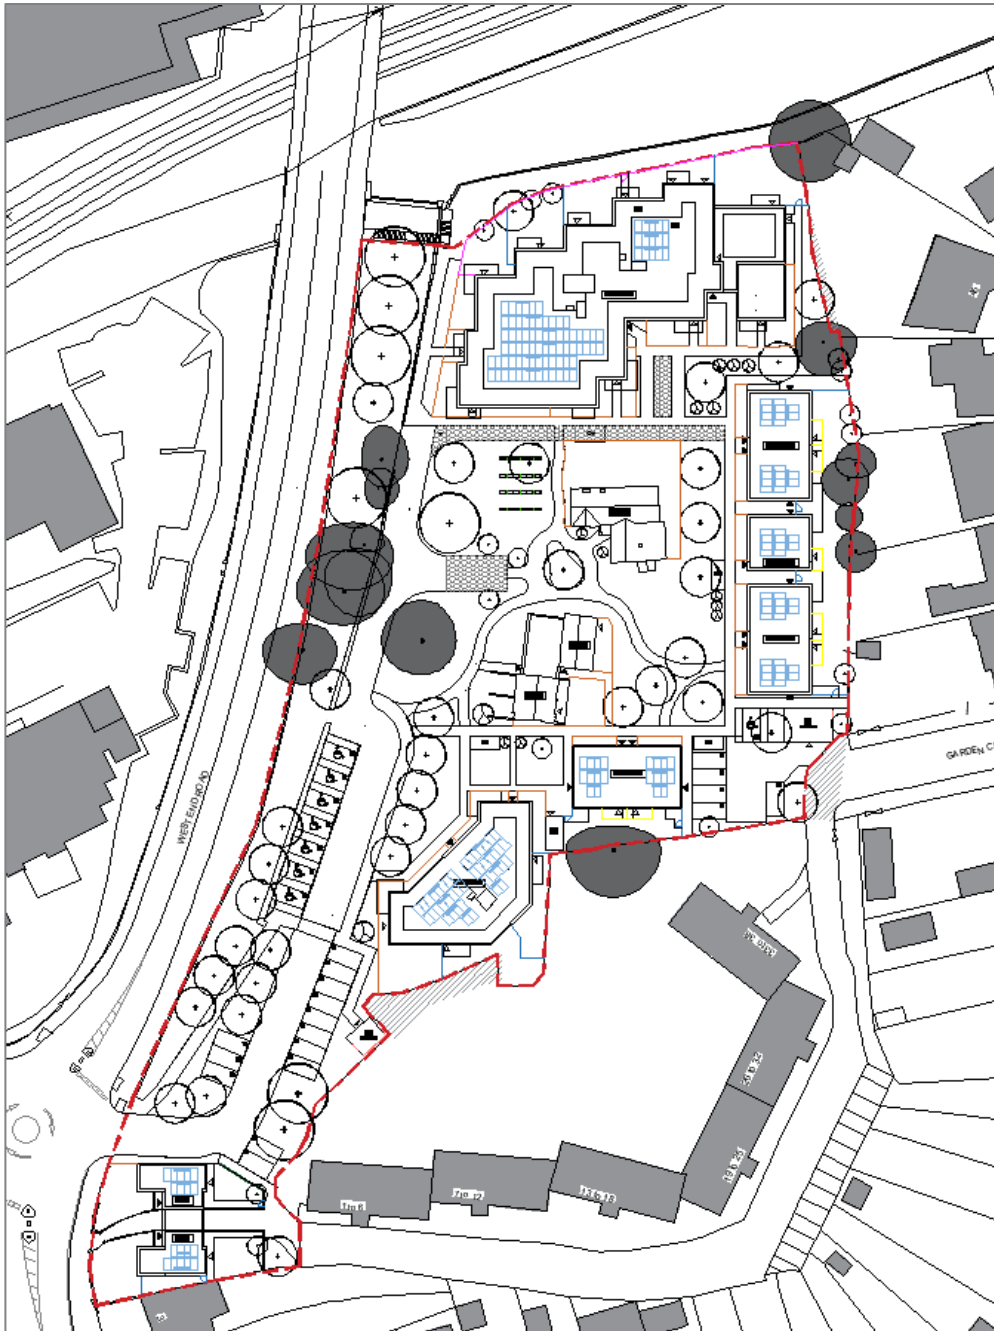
Proposed Block Plan (source: CMYK (Planning & Design) Ltd, August 2024)
